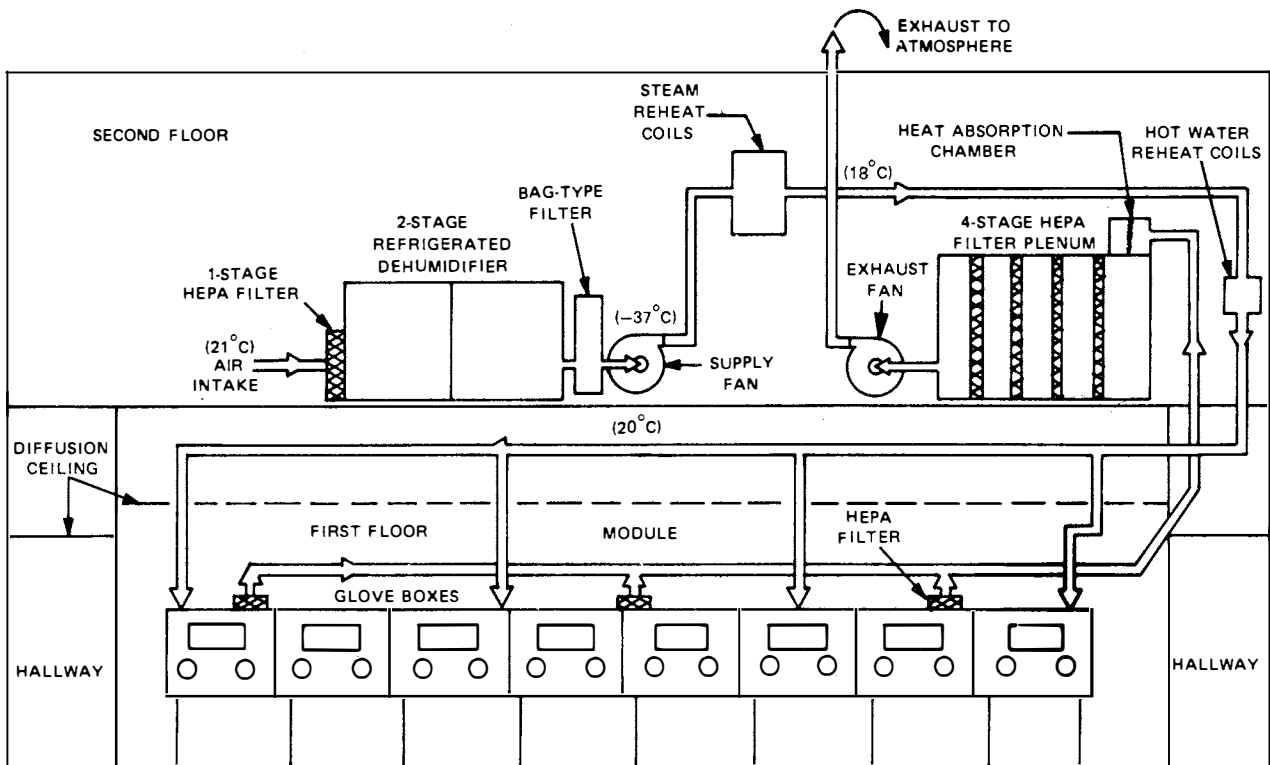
Typical Glove Box Dry Air Ventilation System
